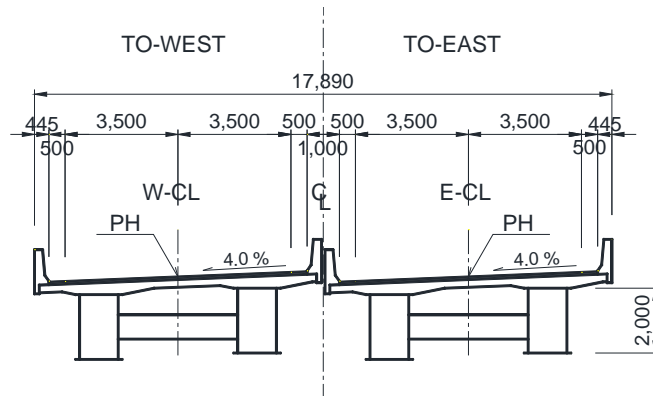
(1) Typical Cross Section of General Bridge Section
